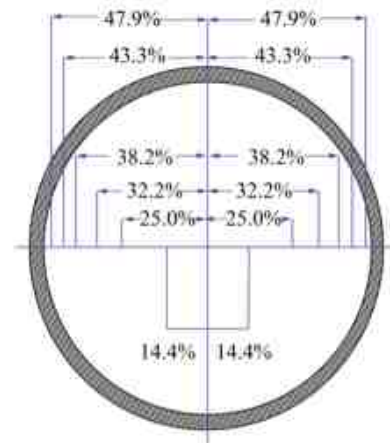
Test Port Layout (Round Duct or Pipe) larger than 305 mm (12") for 6 zones.
